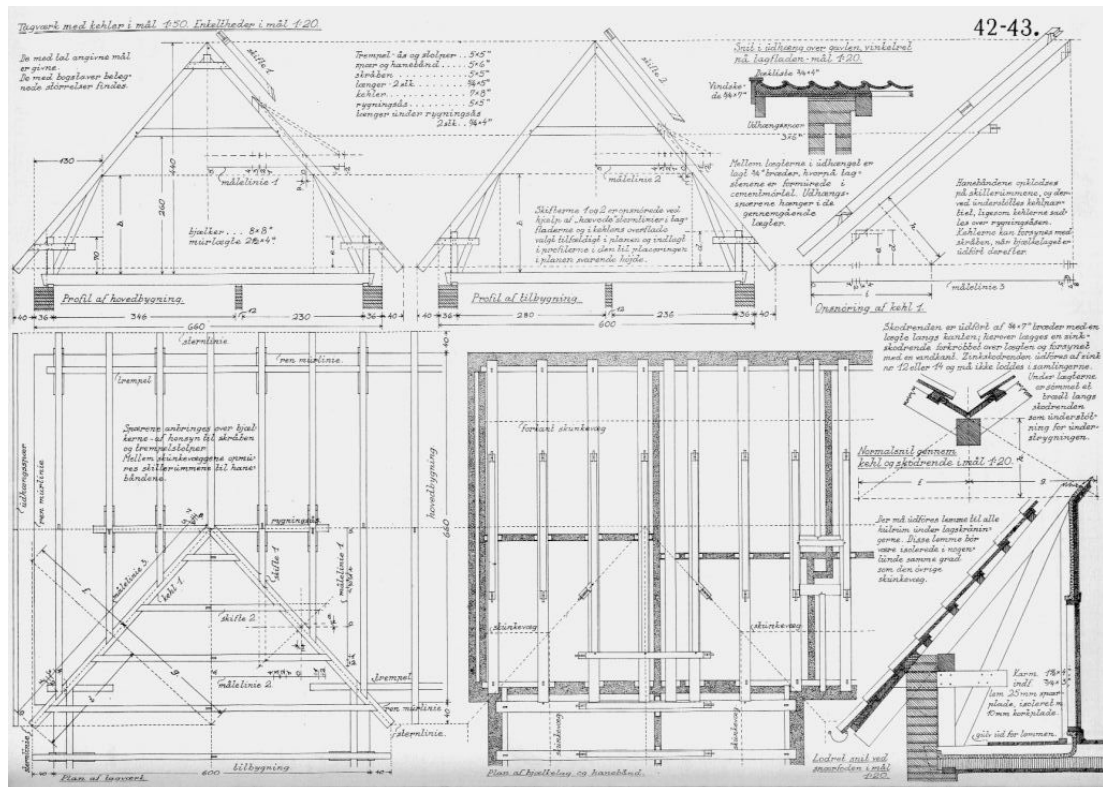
Squared timber rafters as still used in Denmark until 1960
